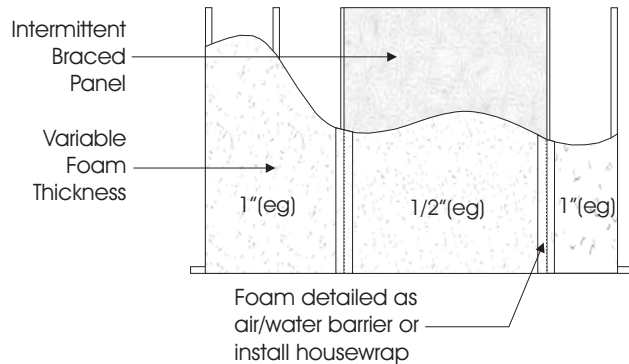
Example of foam sheathing applied to a wall and detailed as a water-resistant barrier to protect the building from rain water penetration.
